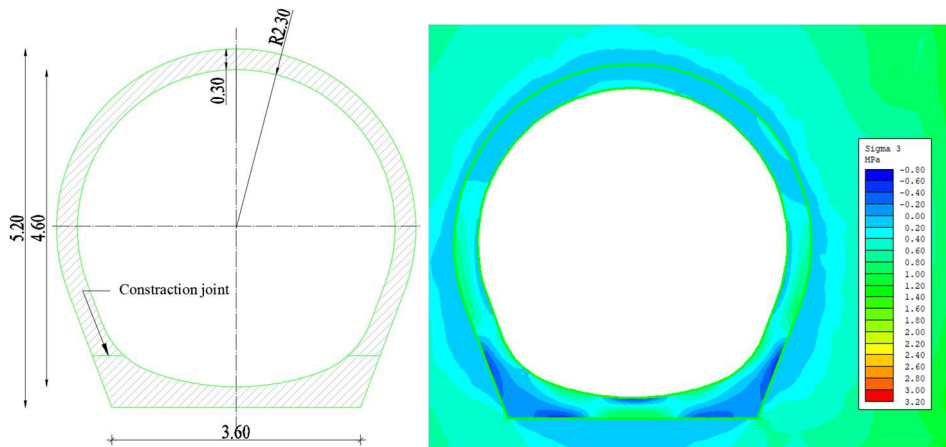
Cross-section of the secondary lining (left), stress field in the concrete of the secondary lining obtained for the hydrostatic pressure of 5.9 bar and grouting pressure of 12 bar (right)
